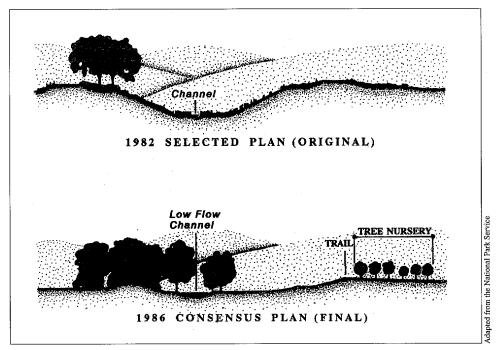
These cross-sections illustrate the two alternative creek channel designs for Wildcat and San Pablo Creeks. The original 1982 plan utilizes a typical box cross-section, high-capacity channel with little or no adjacent floodplain; the 1986 plan eventually implemented includes a shallow low flow channel with floodplain intact allowing trails, tree nursery, etc.
